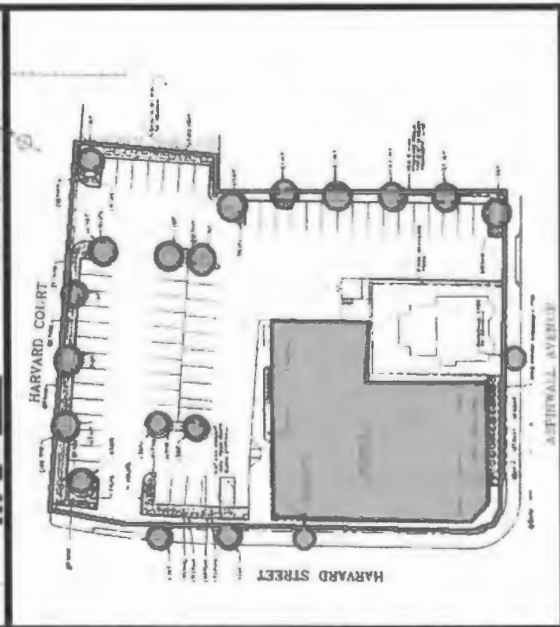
Site plan of current Walgreens. Brookline, Massachusetts. Courtesy of Asfour Associates, Inc.
